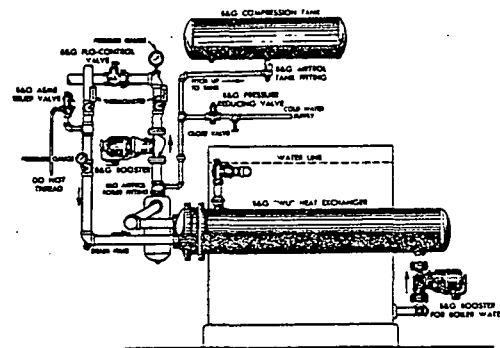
Typical installation of "SU" Heat Exchanger when used with storage tank.
